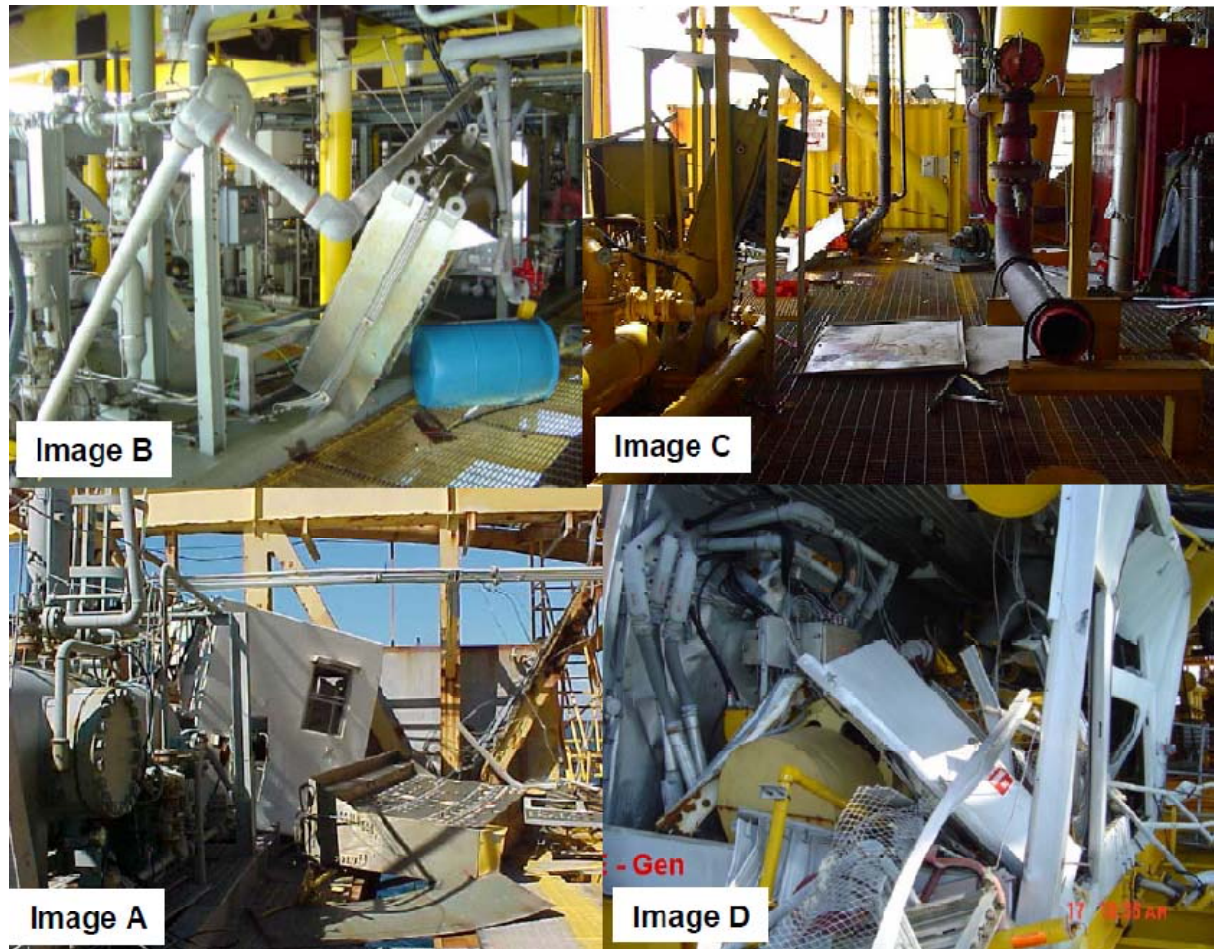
Typical Non-Structural Topside Damage Caused by Wave-in Deck
